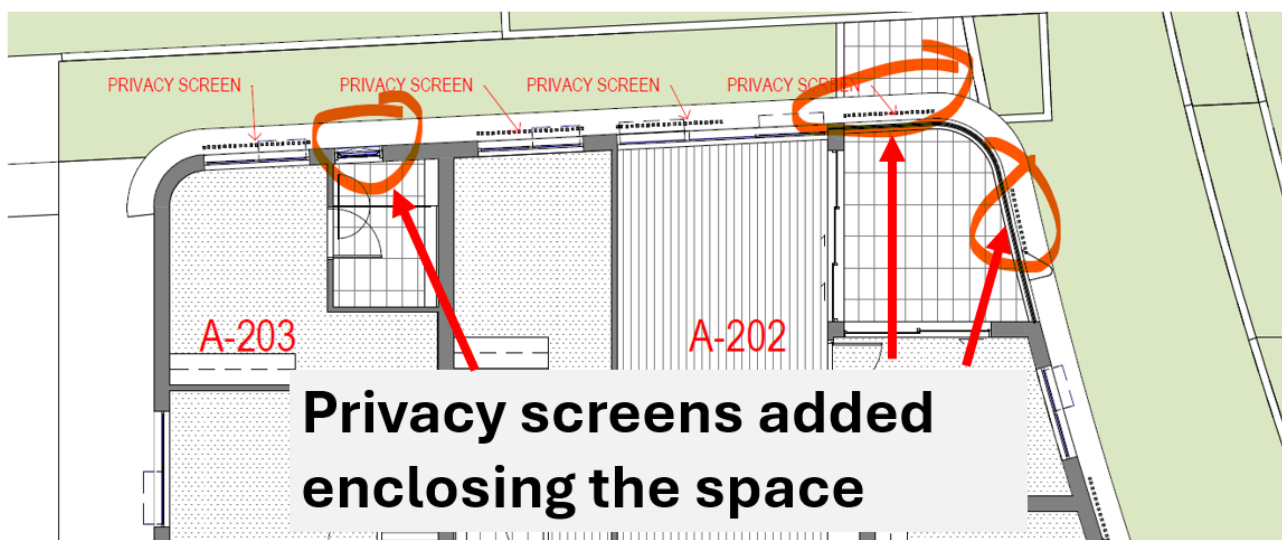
A: Screening for balconies indicated in red (Source: Updated Architectural Plans – DA 9109)
